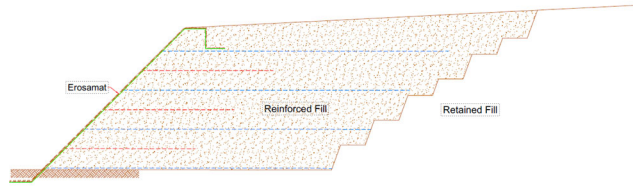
Completed slope, trimmed face with Erosamat fitted.
